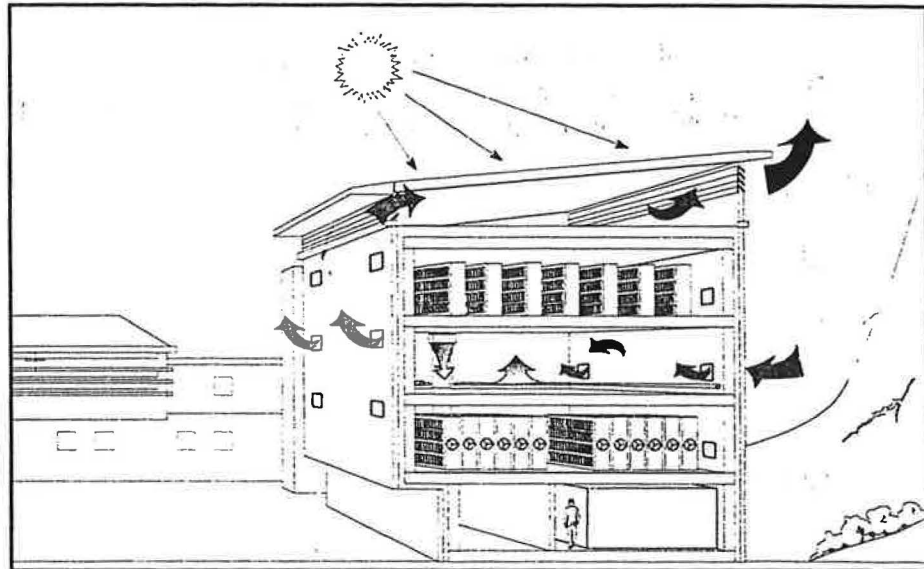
Section through main repository block. Second floor shows actuator driven wall vents, perimeter heating pipe and over-door air curtain (to reduce infiltration).
